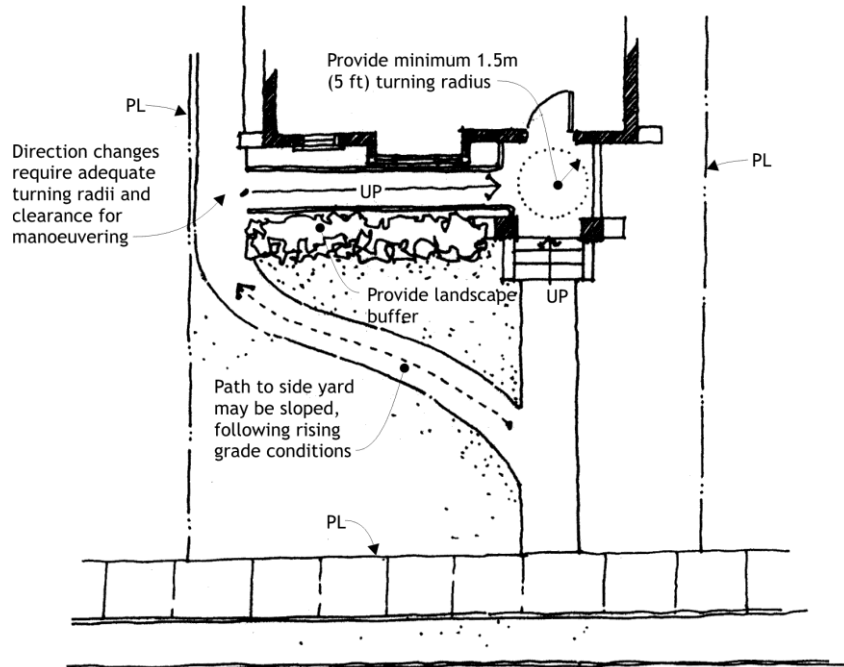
Example of an Existing Dwelling with a Raised Front Entry - Plan View
